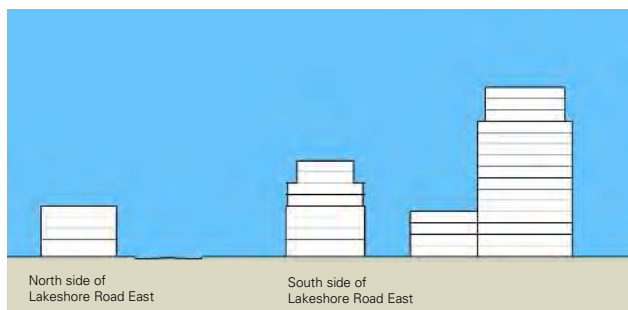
Development in the Lakeview Waterfront along Lakeshore Road East with an 8 storey building and a 15 storey building behind.
